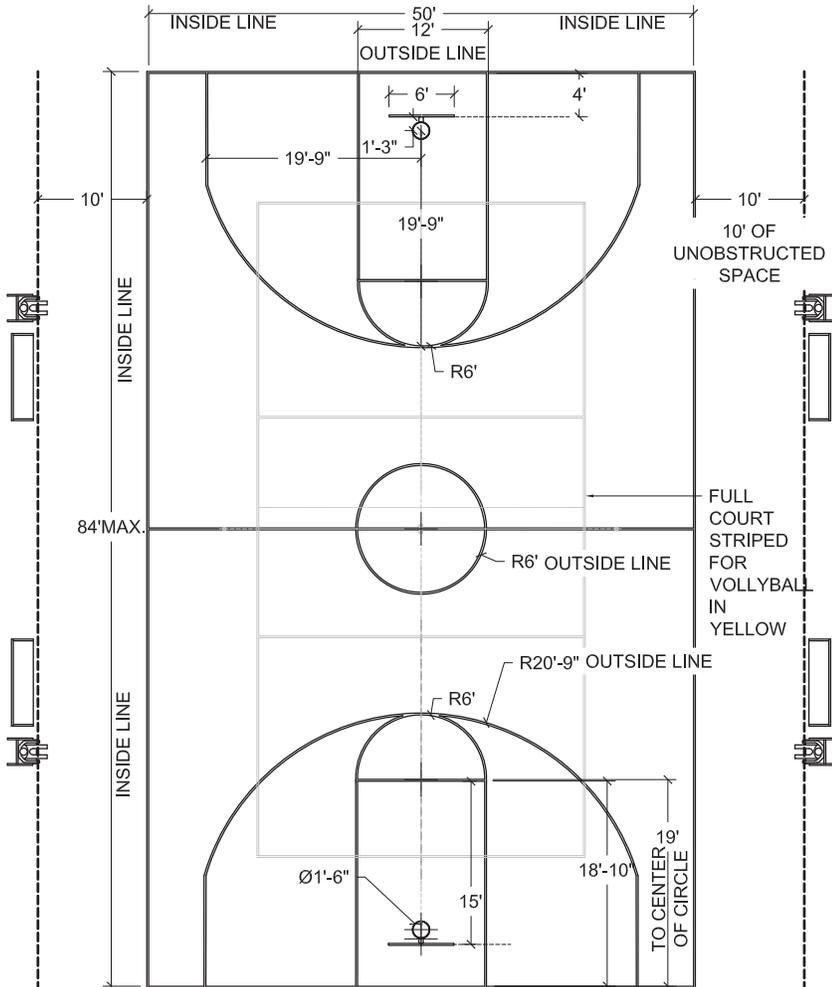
Basketball Court - Standard Layout over Volleyball Court
